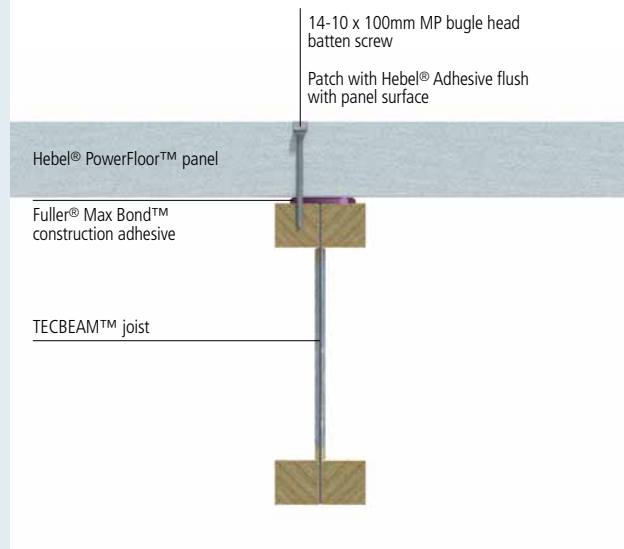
Fixing at end of Hebel® PowerFloor™ panel to TECBEAM™ joists
